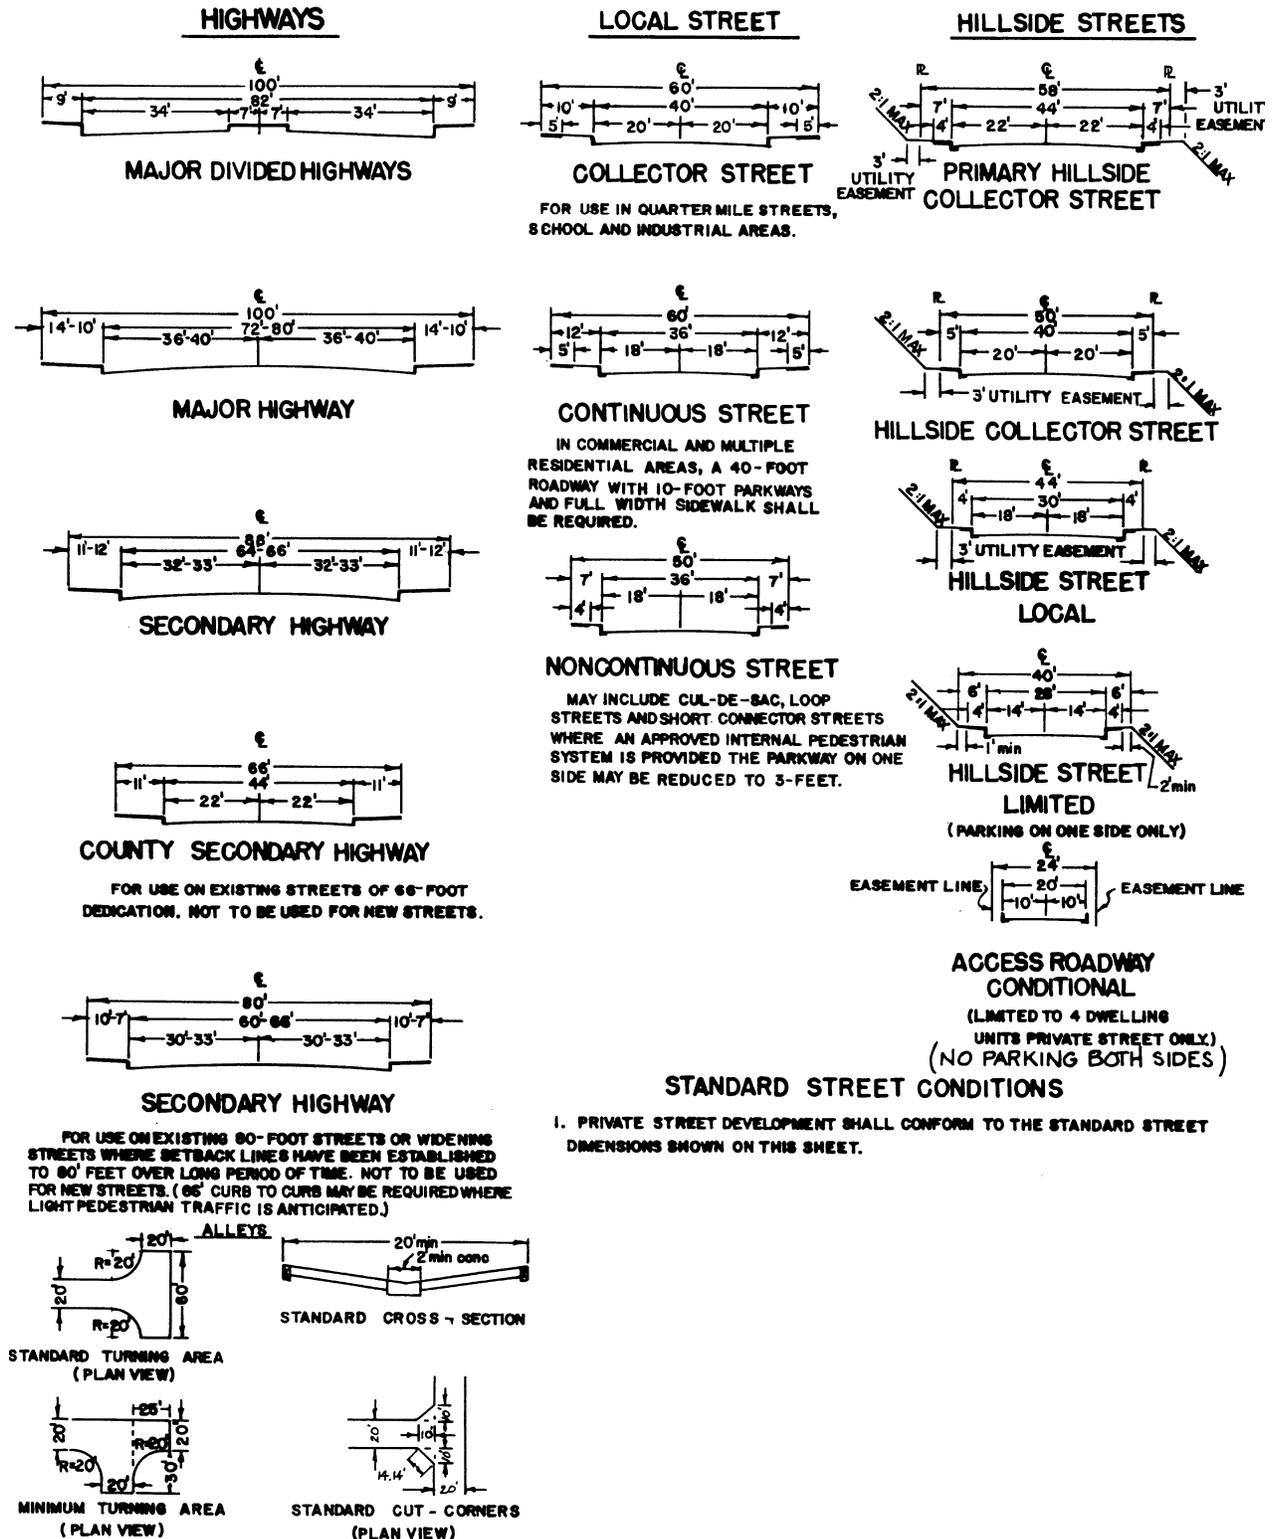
CITY OF SAN BERNARDINO GENERAL PLAN ROADWAY CROSS-SECTIONS
